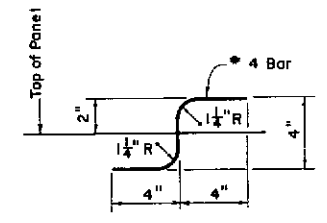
DETAIL - PRECAST PRESTRESSED PANELS - RECTANGULAR
